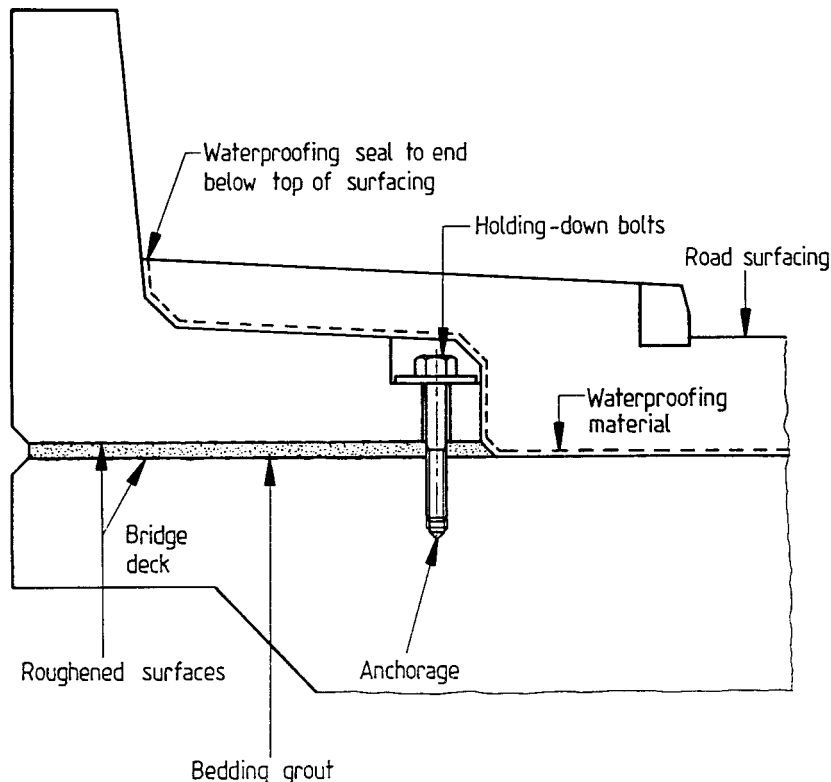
Diagrammatic arrangement of a possible precast reinforced concrete panel installation
